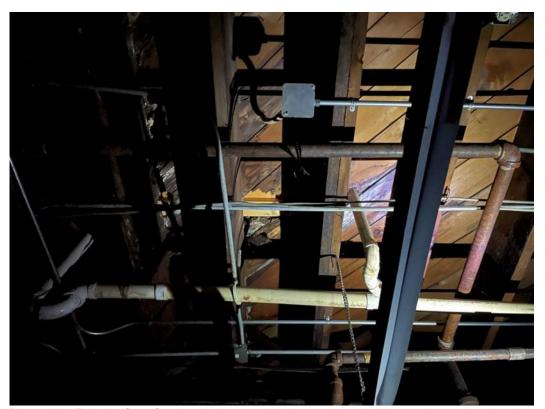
Existing floor framing is damaged by long term plumbing and envelope leaks at several locations inside the building.
